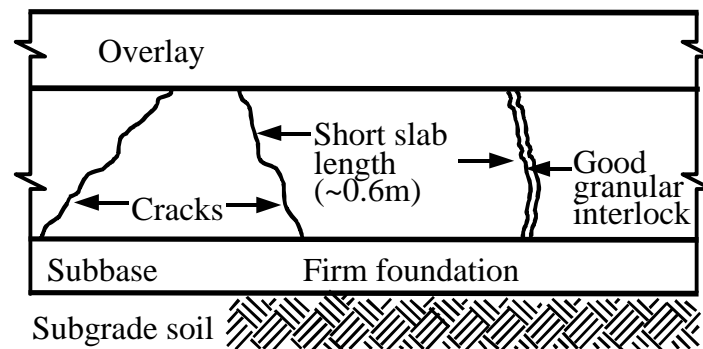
Illustration of a crack and seat pavement.
